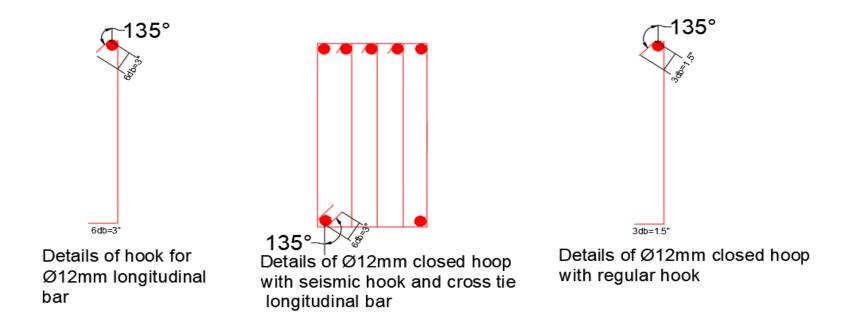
Details of Closed Hoop and Cross Stirrup of Beam.
